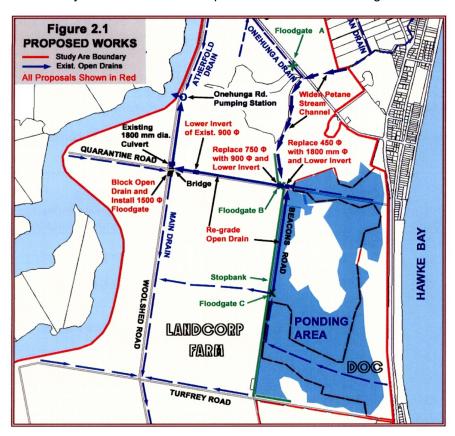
Bay View stormwater drainage pond extent on Ahuriri Station
